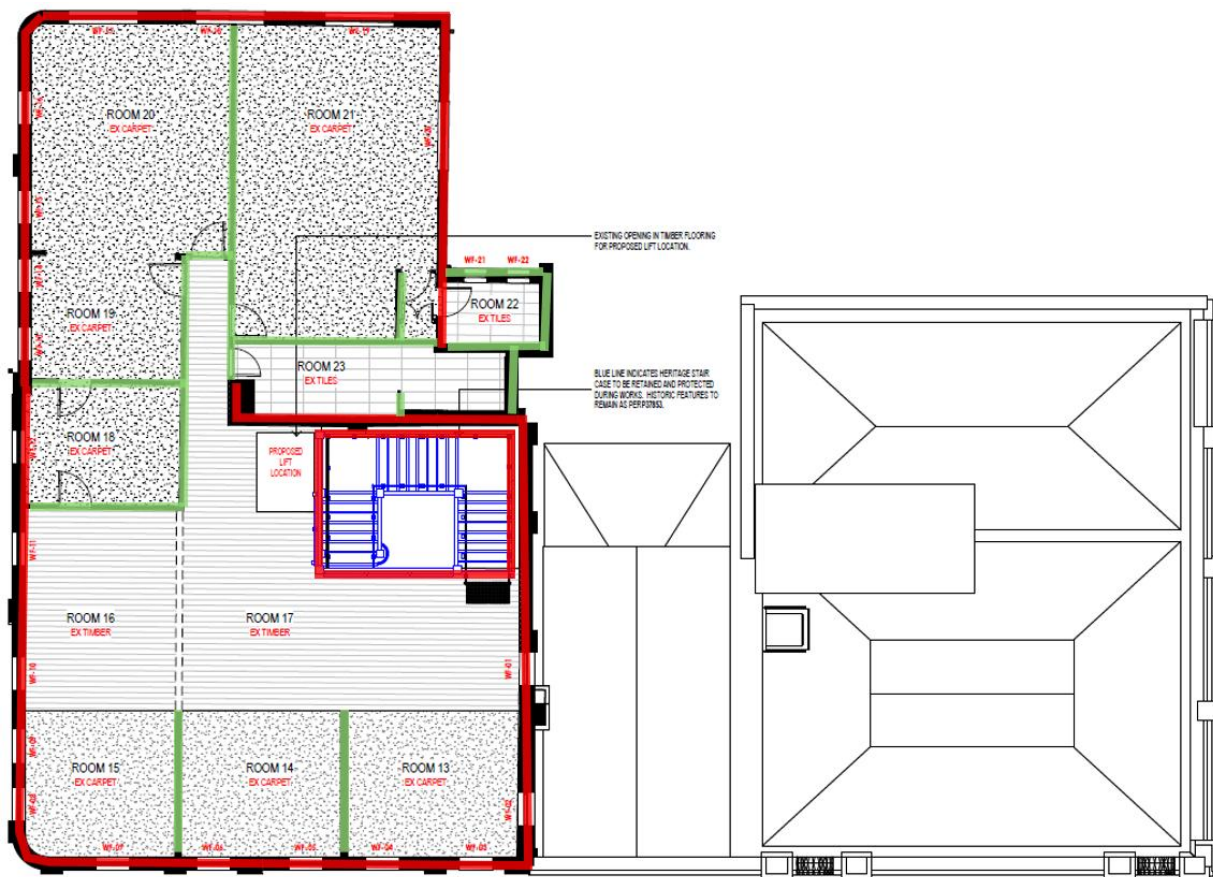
Existing first floor plan showing layout of early or original walls in red (1909-1950), and later additions in green.
